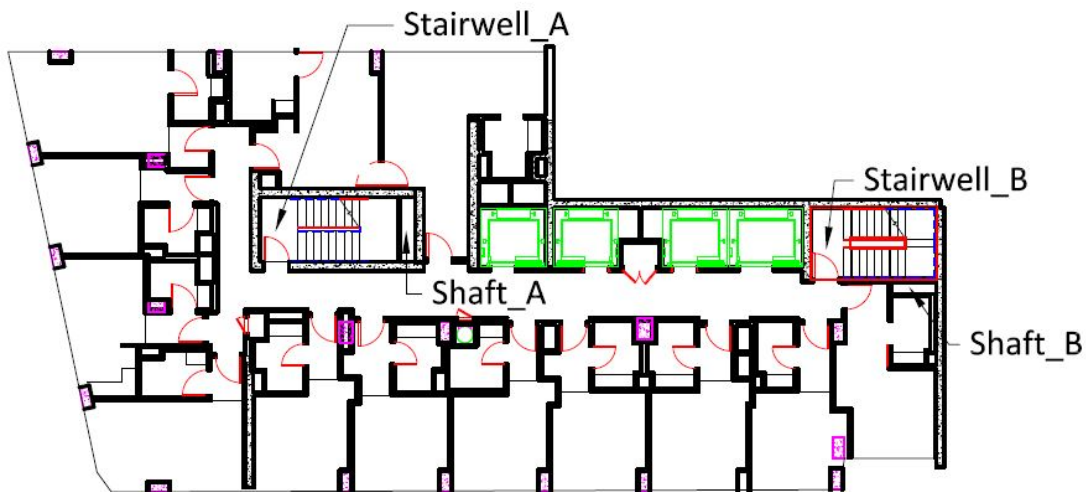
Leakage drawing of the 7th through 17th floors showing location of stairwells and duct shafts.
